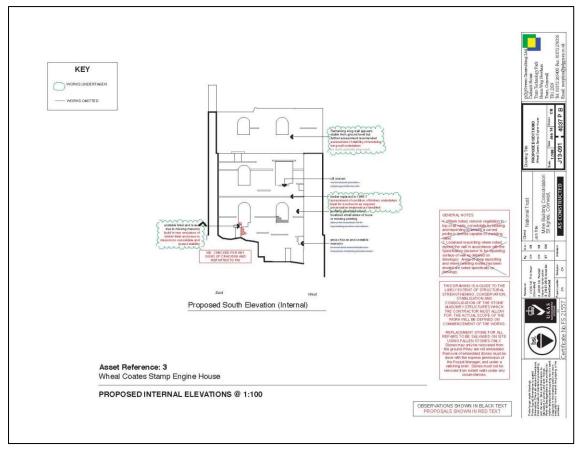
Southern internal elevation of Wheal Coates stamps engine house.
